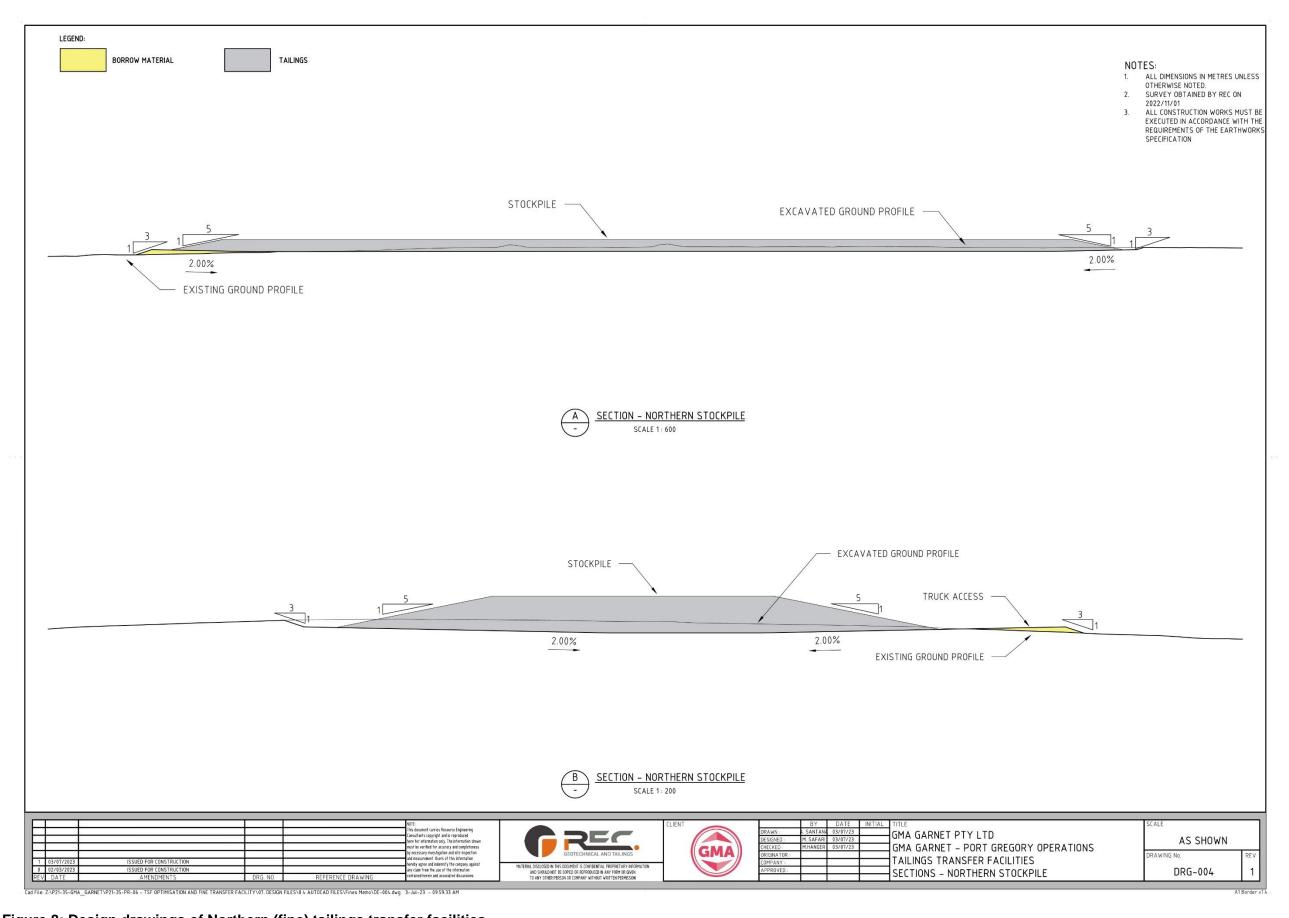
Design drawings of Northern (fine) tailings transfer facilities
